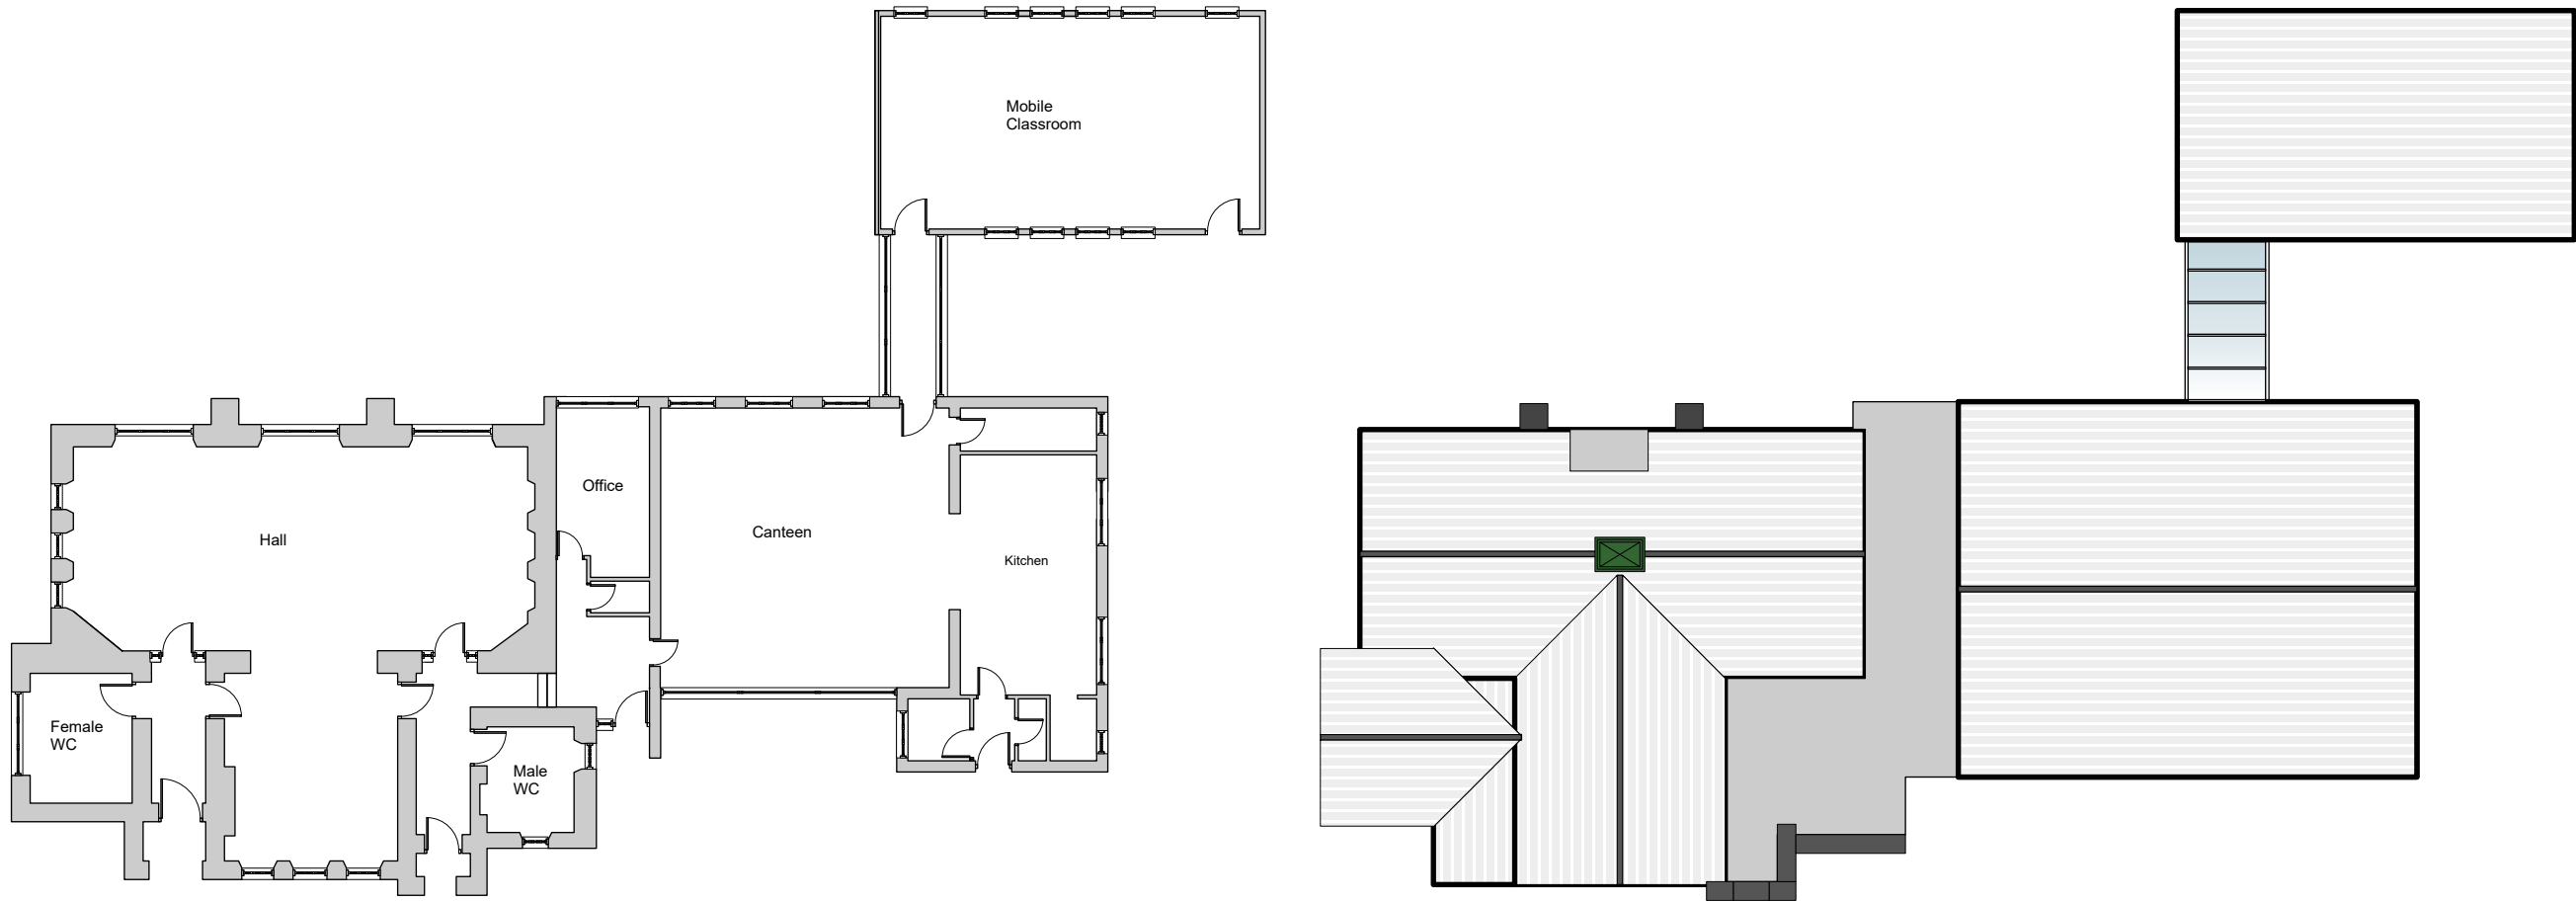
Plans and Elevations of Llanwnnen Primary School prior to development works.
